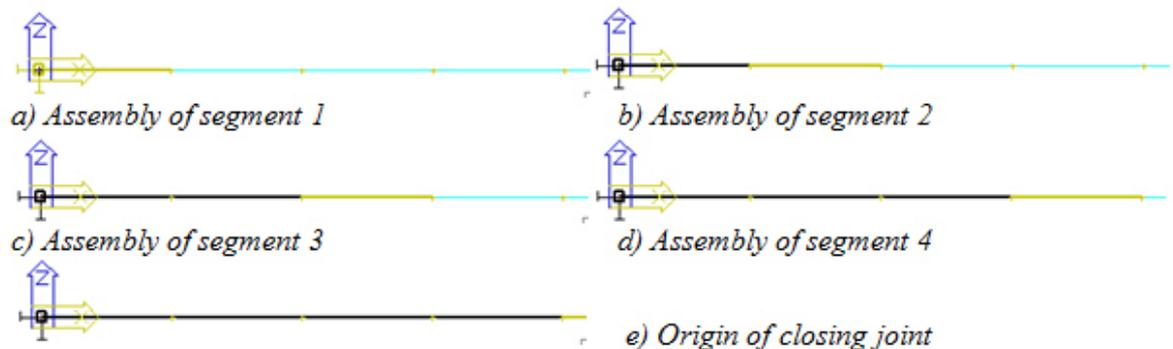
“Precise levelling” precast segmental cantilever construction, construction stages
